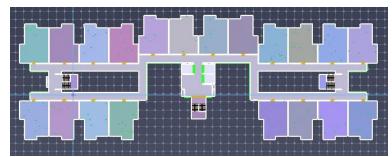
Building Plan of Simulation Study Using the Typical Layout of Public Residential Buildings in Malaysia
